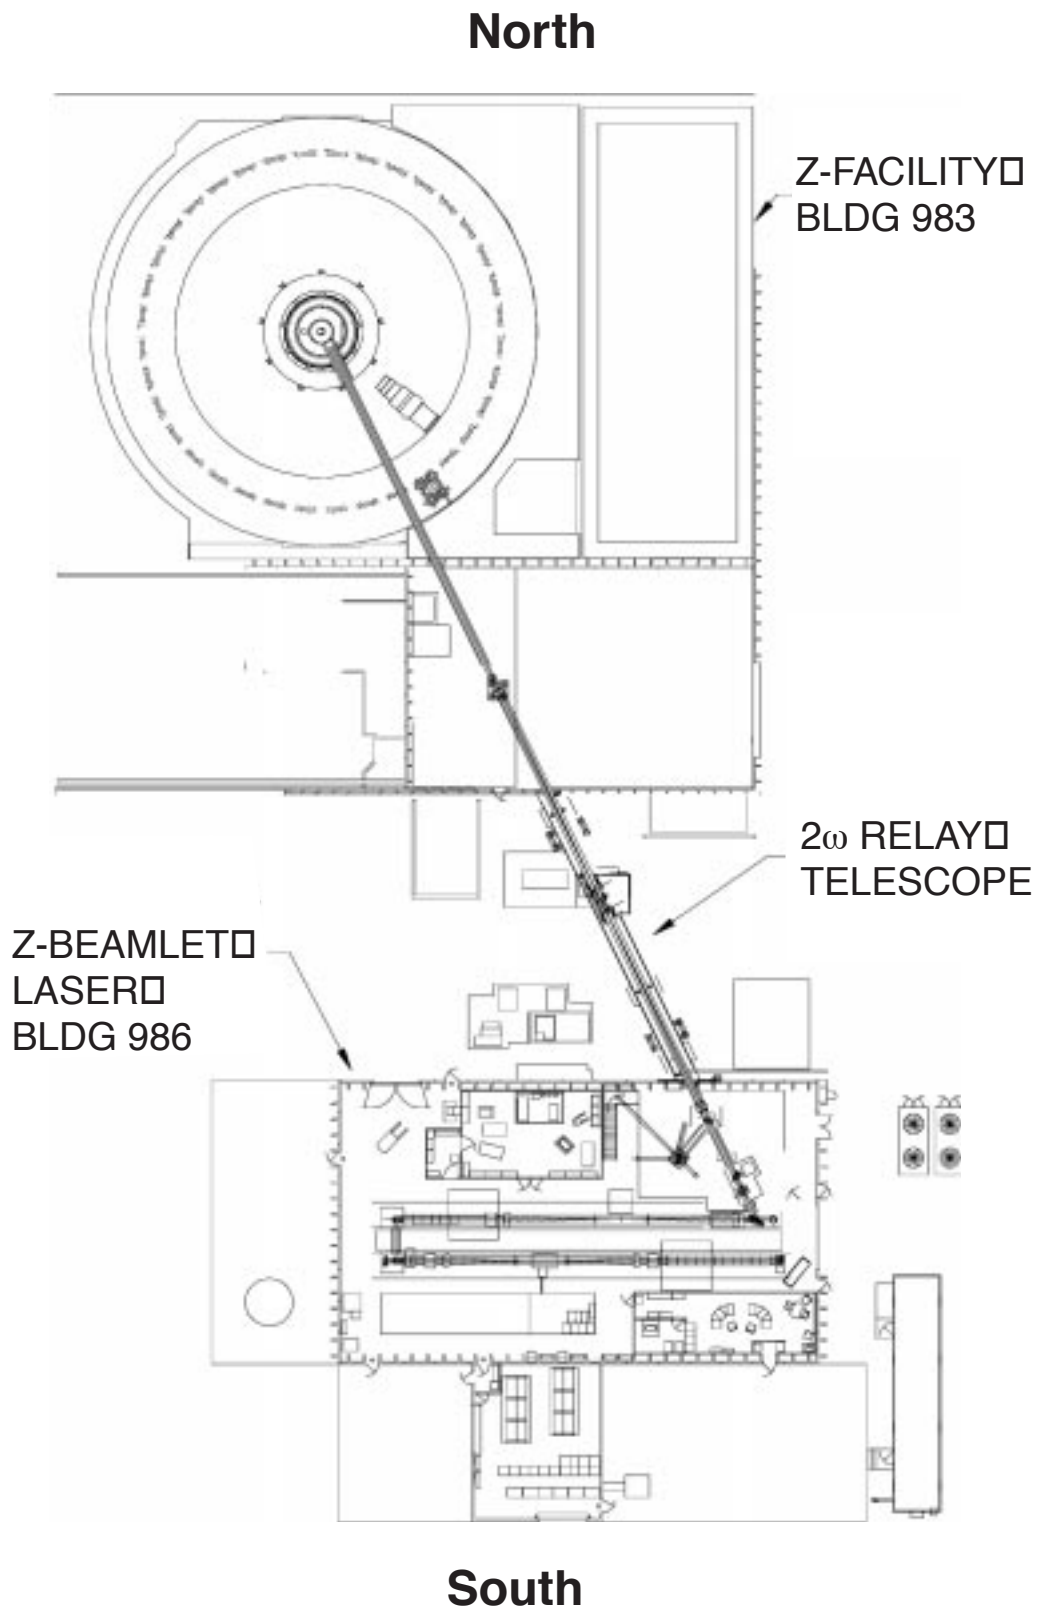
Proposed Z-backlighter system layout (view 2).
